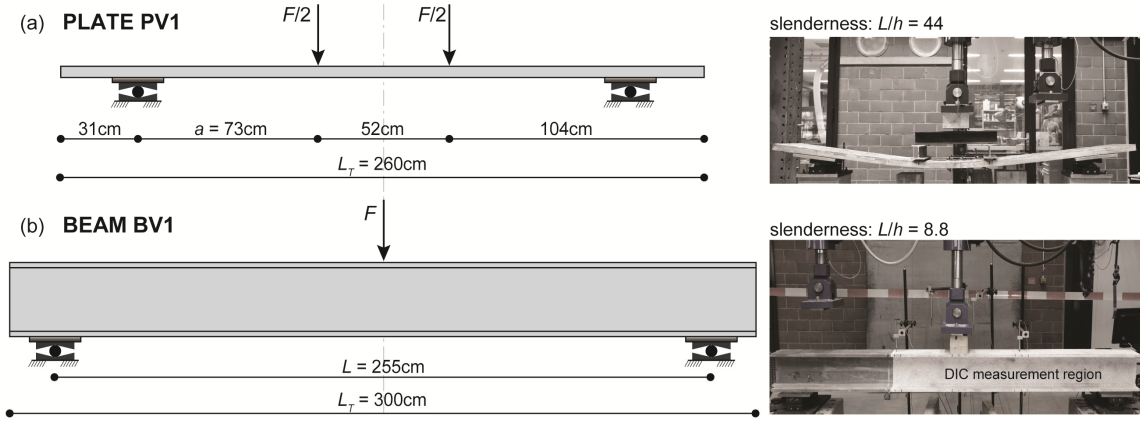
Specimen and test set-up for the flexural tests: a) Plate, b) beam.
